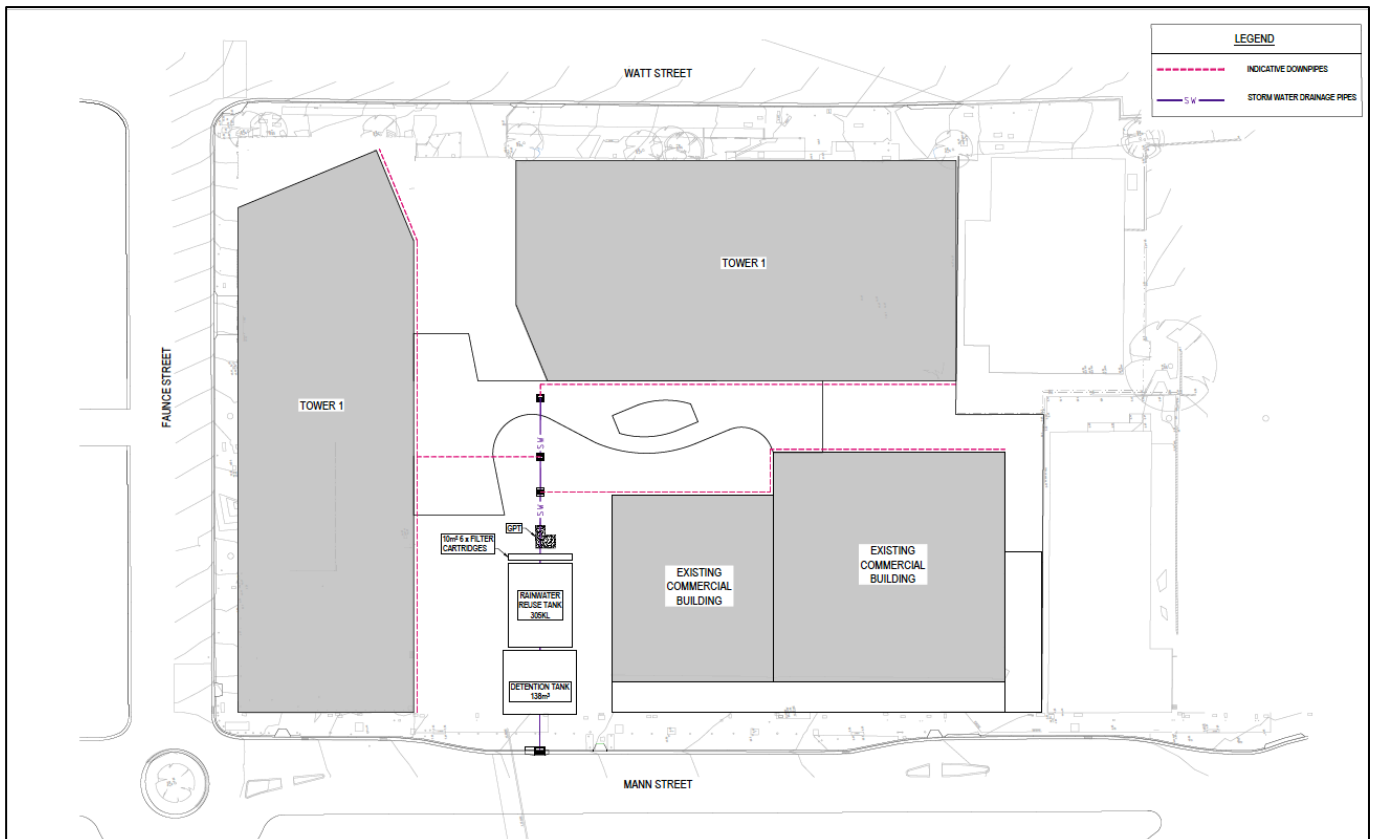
Concept Stormwater Management Plan (source: ACOR Consultants)
